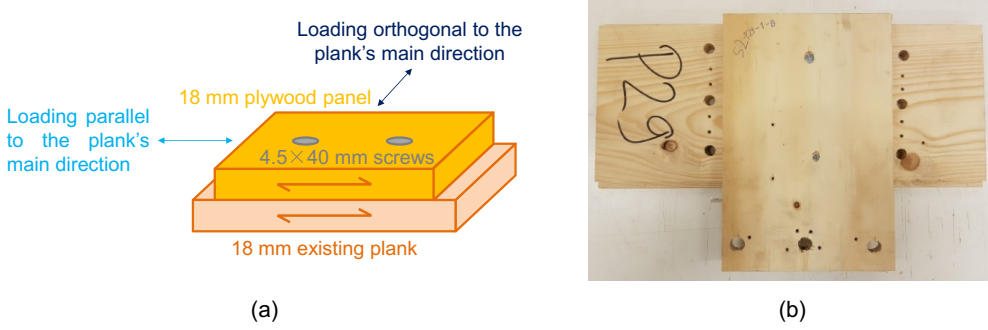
Samples prepared for the tests on screws fastening the plywood panels to the existing sheathing: schematic description (a) and example of specimen (b). From [174].
